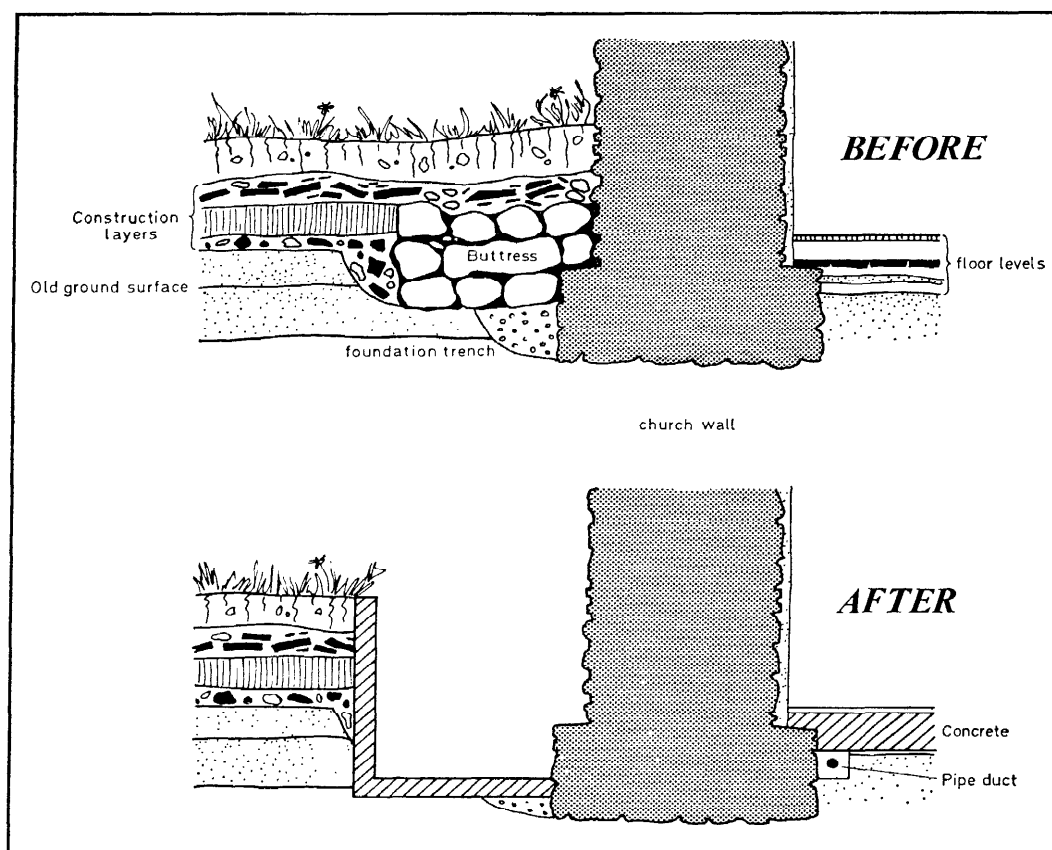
Diagrams illustrating the kind of destruction which takes place when a church floor is concreted and an external drain dug around the base of the walls. The before diagram is based upon evidence recovered from the excavations at Rivenhall and Hadstock churches
